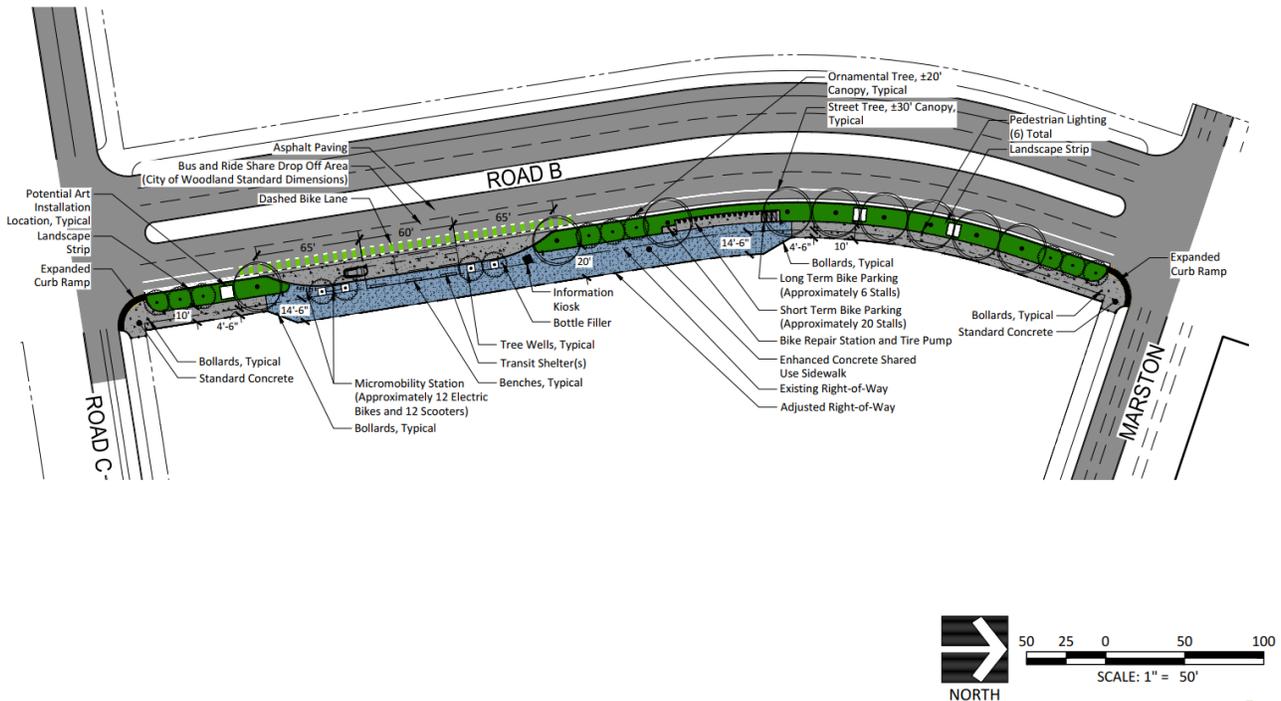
CONCEPT SITE PLAN OF THE MOBILITY HUB “THE UNION.”
